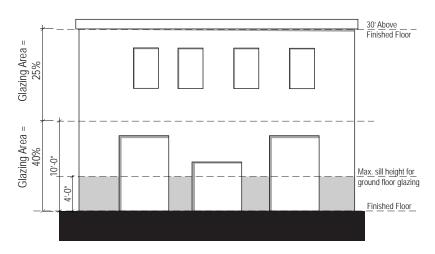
Commercial or Mixed Use building meeting glazing requirements.
